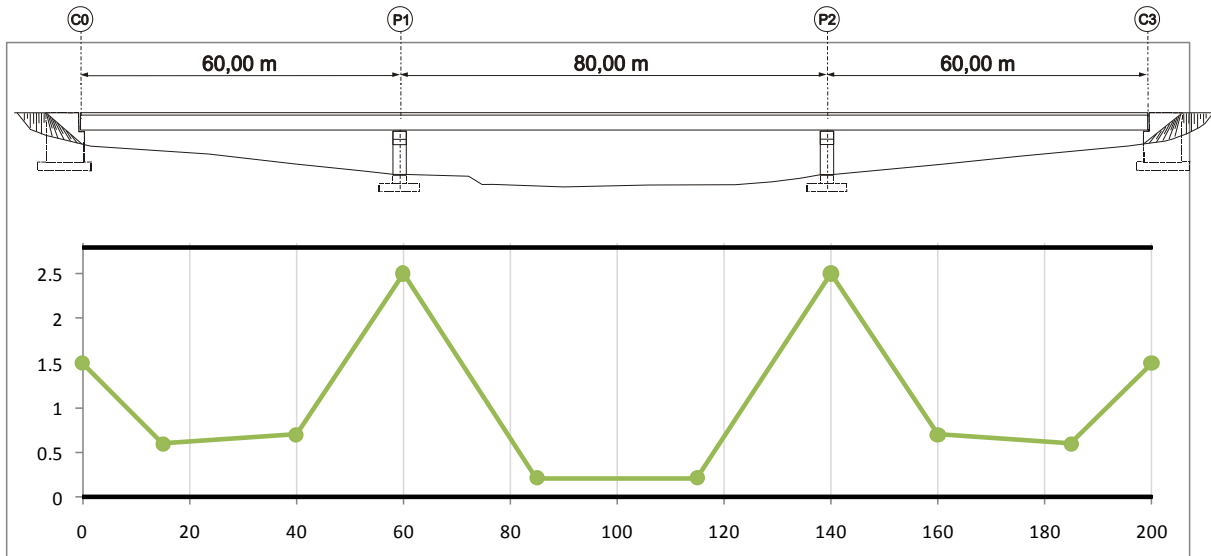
Alternative deck: Longitudinal prestressing layout
